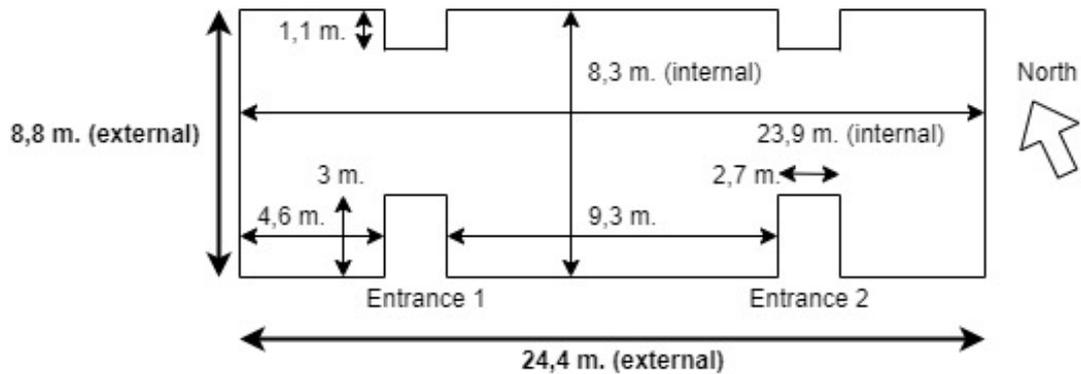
Ground floor - Building definitions before renovation, internal, and external measures are shown. The bolded lines and texts are external measures.
